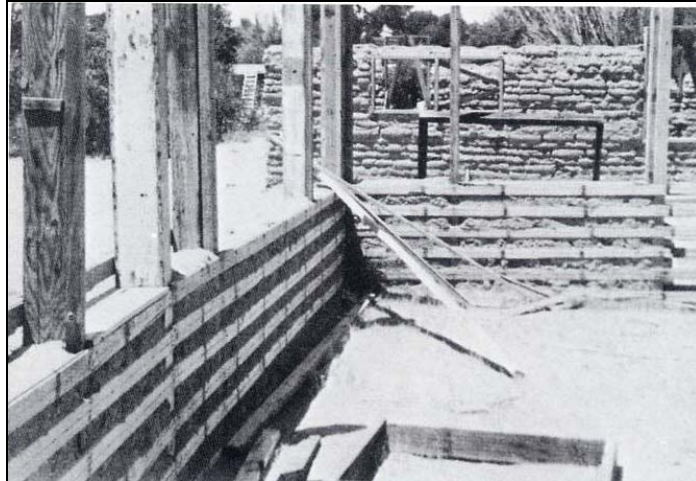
The Sandwich Wall. The sandwich wall was a hybrid of Native American and Spanish building techniques (Nabokov, 1989)
